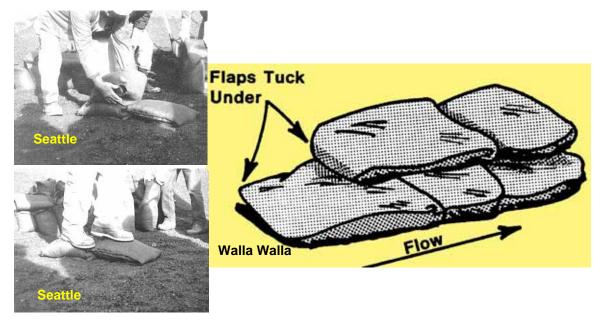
Walla Walla and Seattle Districts' design for placing sandbags
